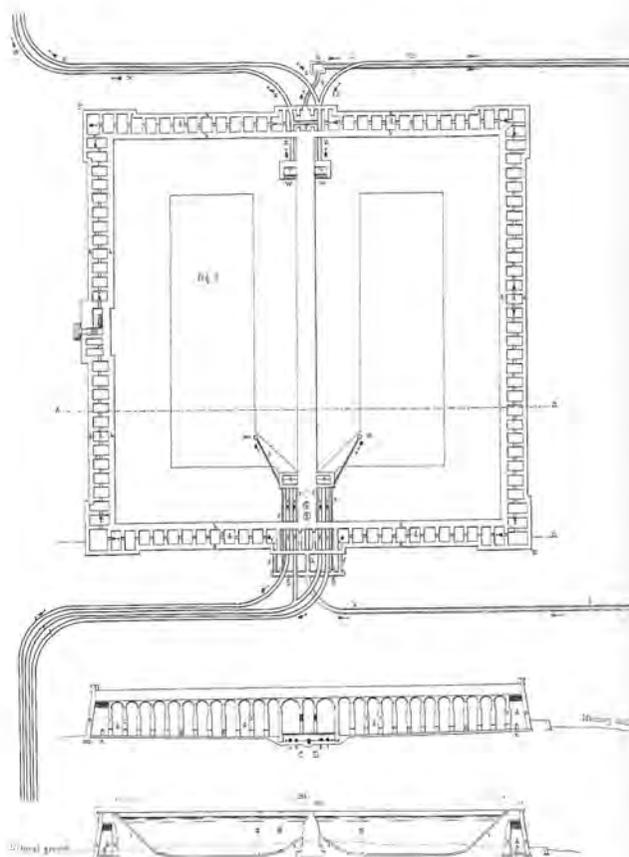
Murray Hill Distributing Reservoir. Plan and sections showing vaulted perimeter masonry walls.
